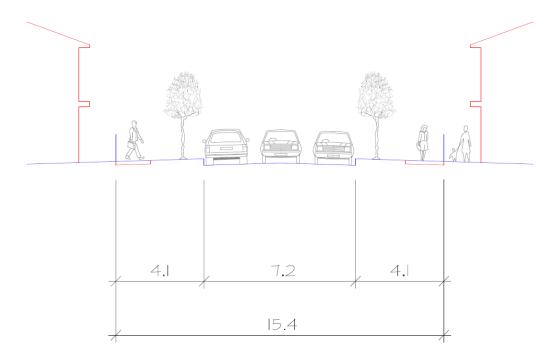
Typical Cross Section for a 15.4 m Access Street C
